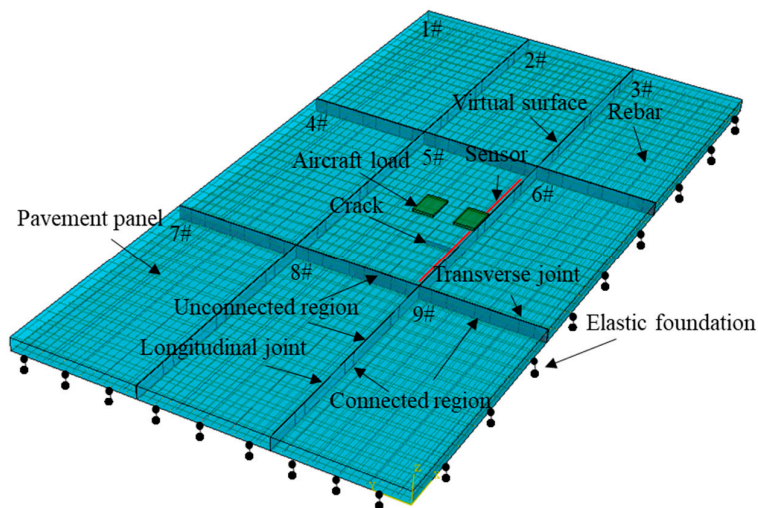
Finite element model of prefabricated pavement 9-plate combination.
